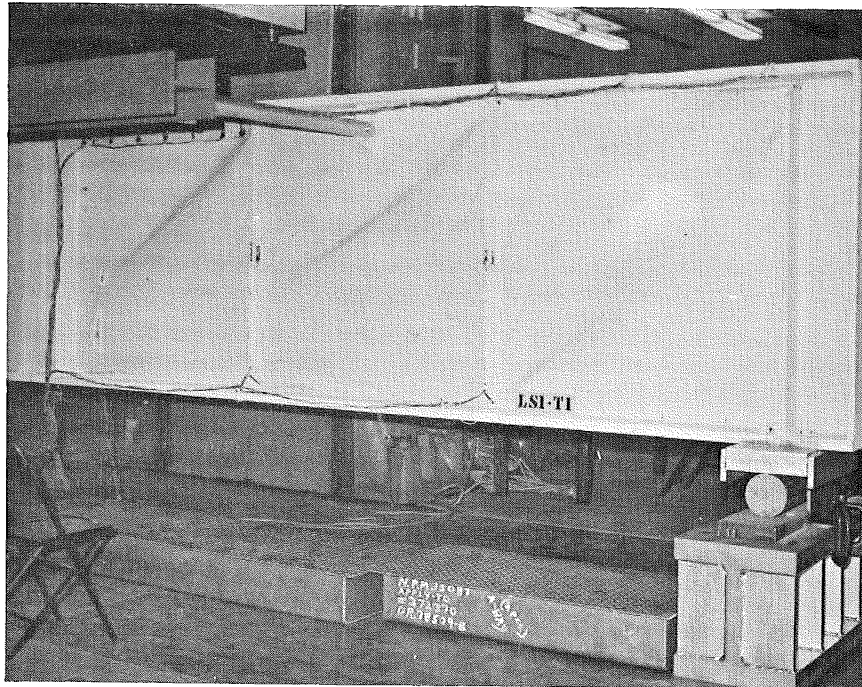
Yield Patterns in Girder LSI at Load No. 14
